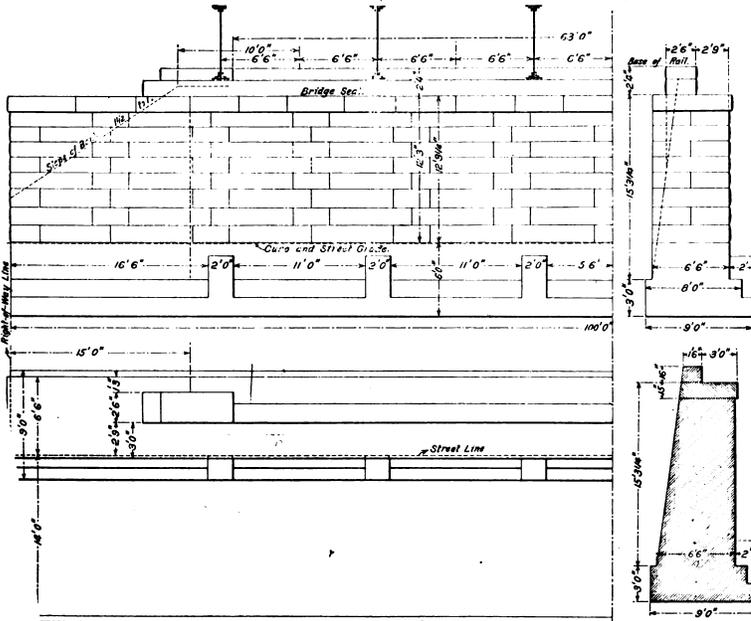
Homan Avenue Subway—Chicago Track Elevation
